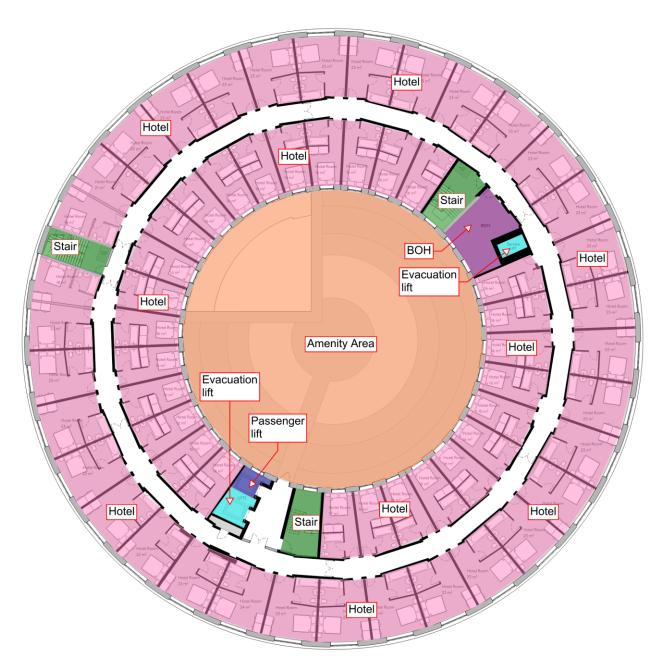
Hotel Floor Plan (i.e. First-Third)
